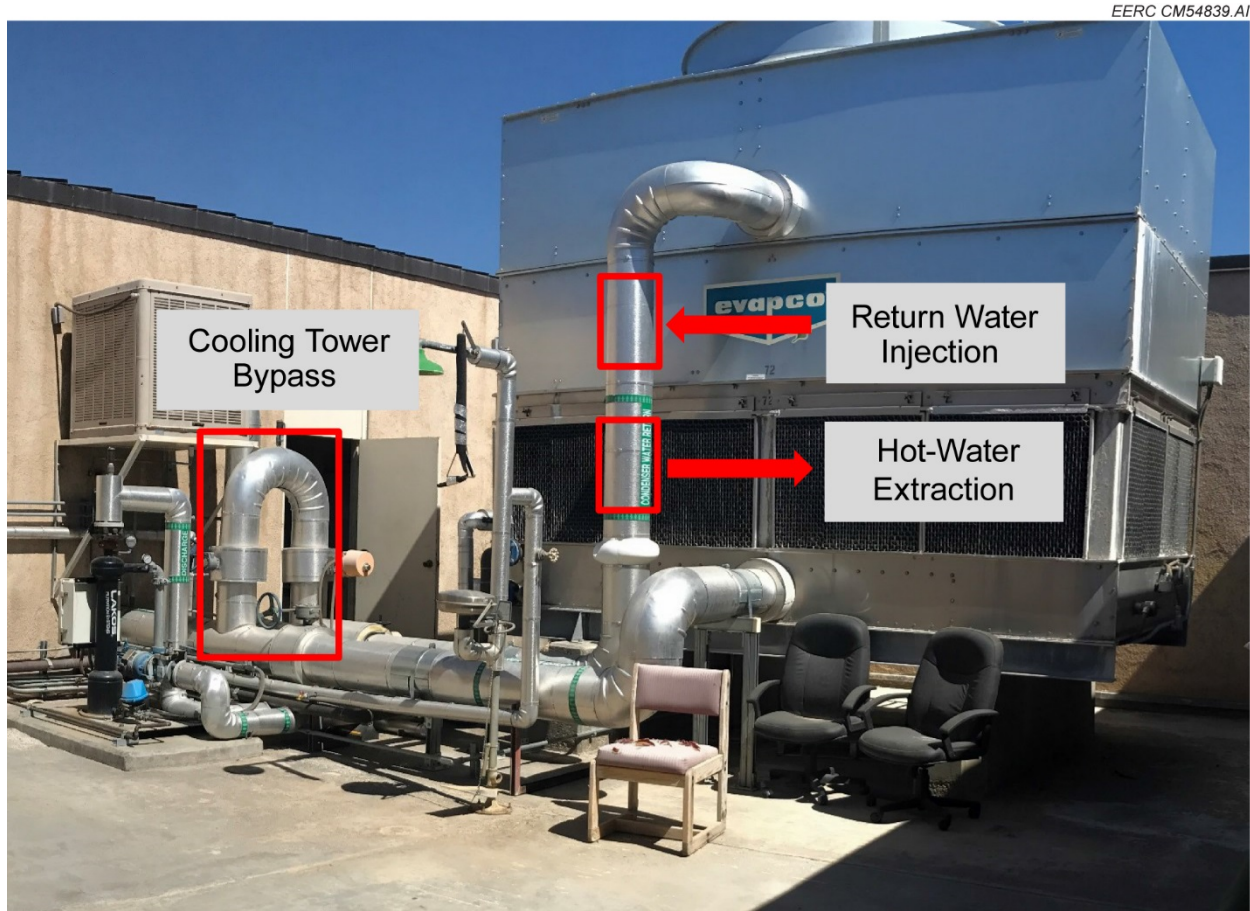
Proposed hot-water connection points in the walled cooling tower enclosure at Fort Irwin Building 263.
